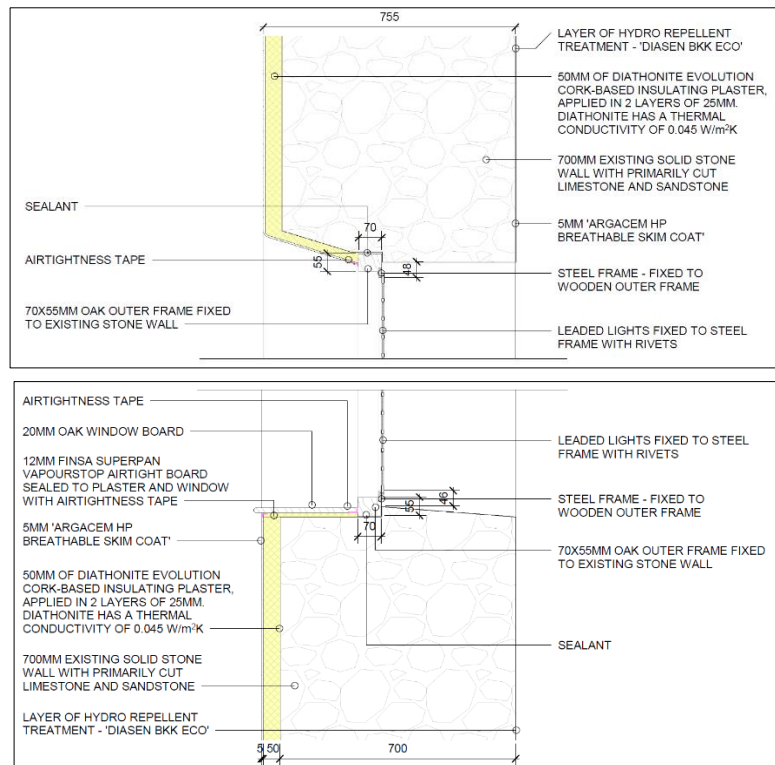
Replica Windowsill & Head Detail (Source: Author).
